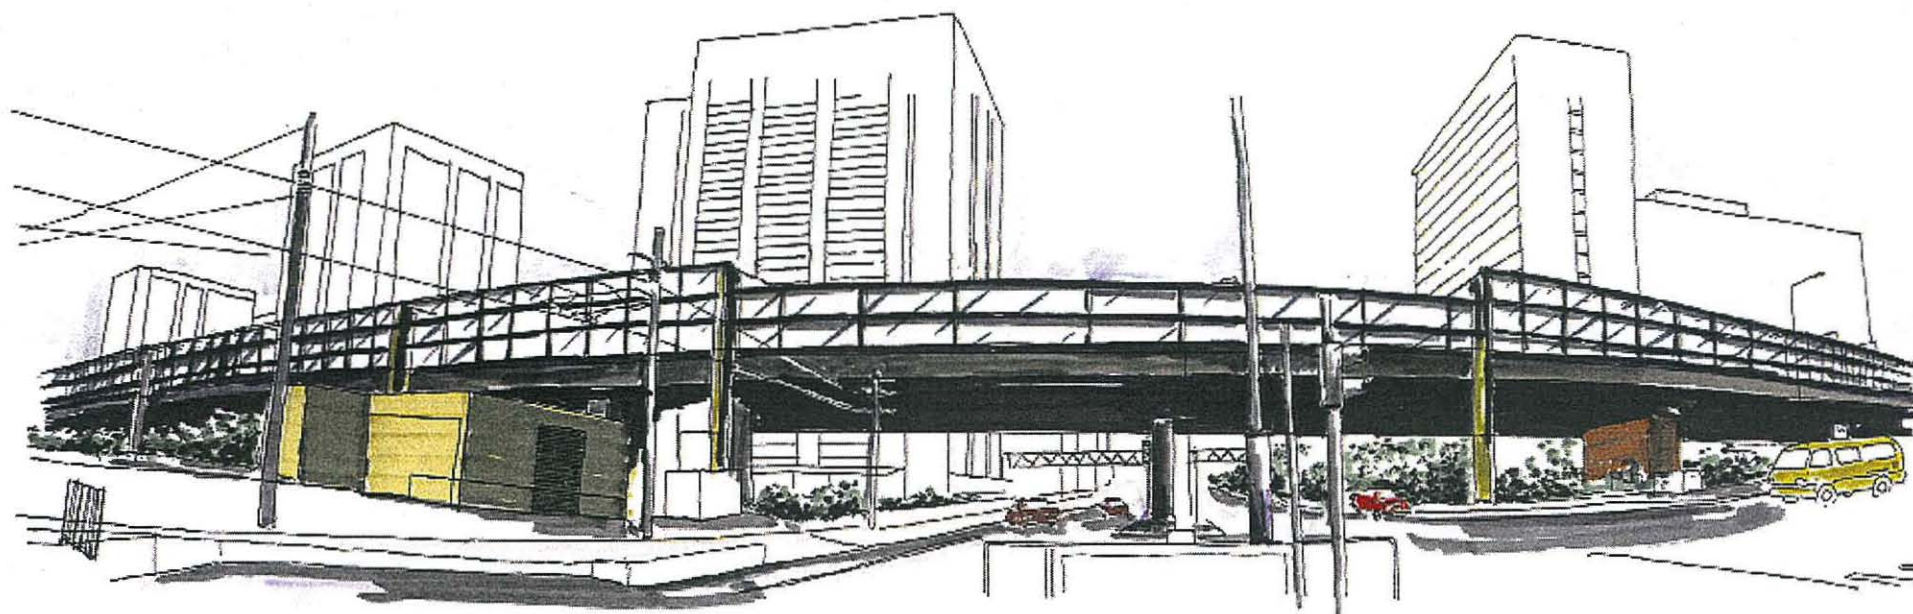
A PERSPECTIVE SKETCH OF THE PROPOSED ENCLOSURES AND CANTILEVER BARRIER ON WONG CHU ROAD
